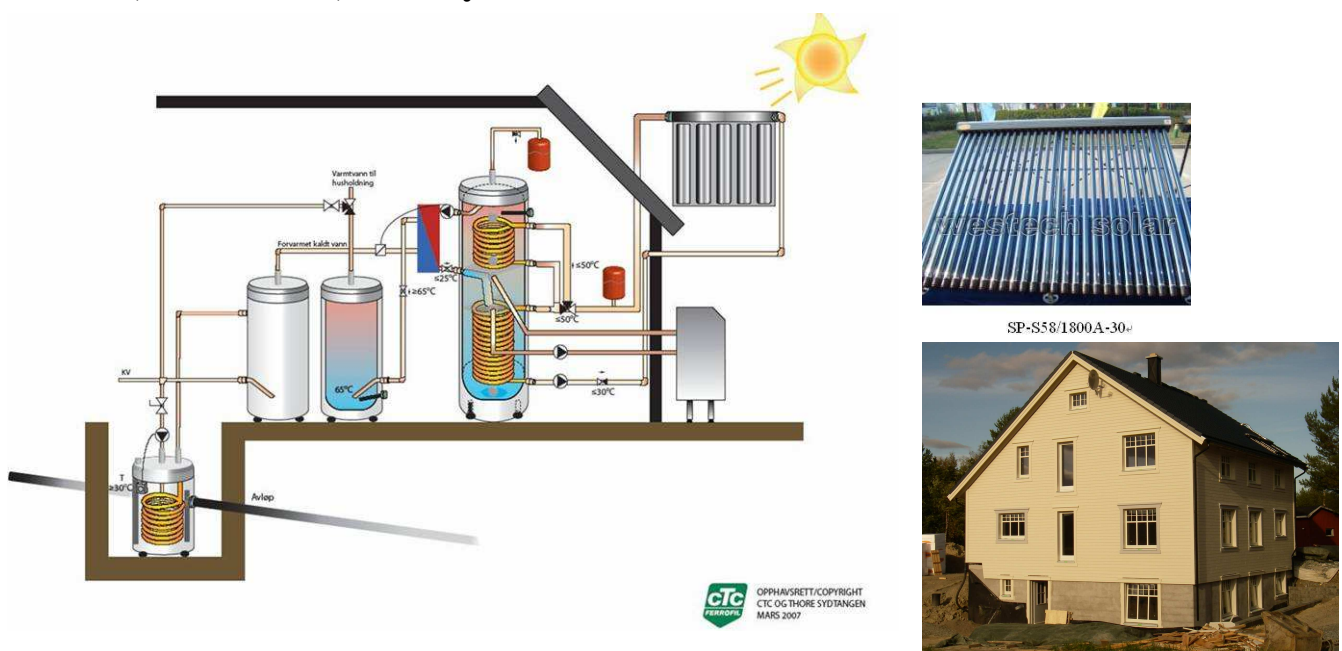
Left: System layout (illustration CTC Ferrofil). Upper right: Vacuum pipe collectors from Westech. Lower right: Photo of the SolarOne house (Photo: Harald Ringstad).
